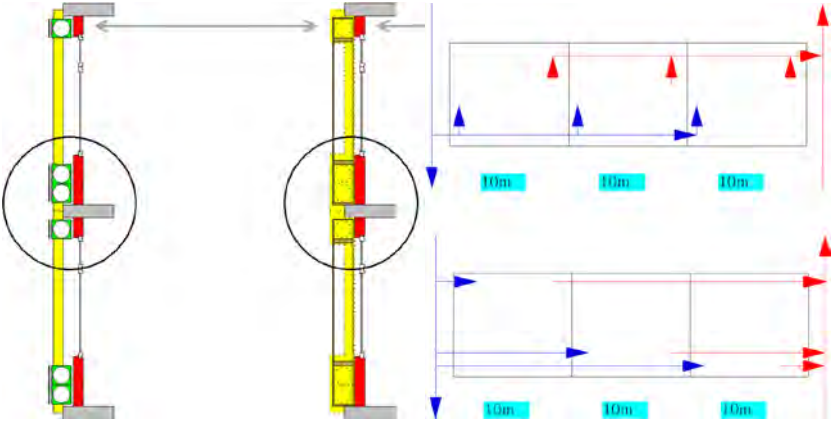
Central ventilation with horizontal air distribution and smaller effect on architecture; Left: Cross section of two façade-Stores; Right: Elevation of two façade-stores with horizontal ductwork
